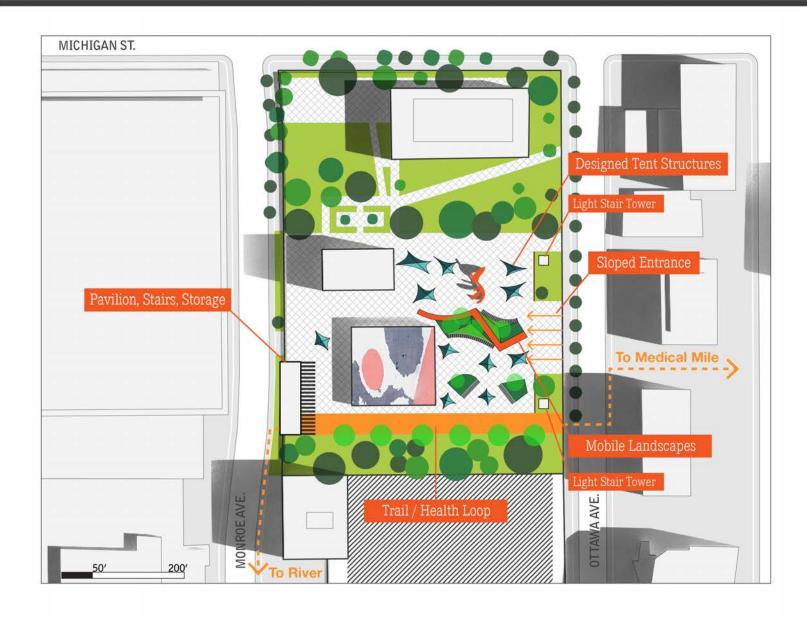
Potential alternate Monroe Ave access to Calder Plaza
